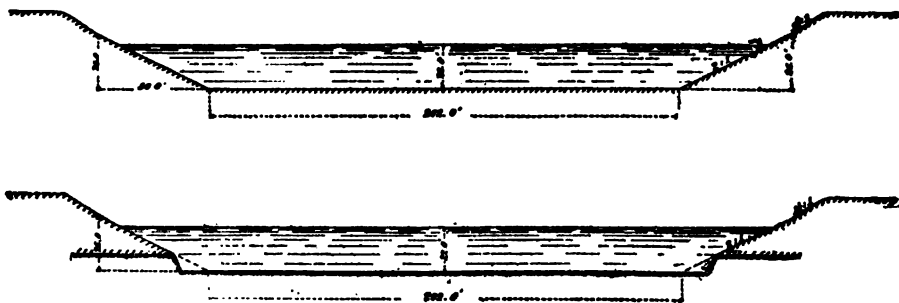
CROSS SECTIONS OF DRAINAGE CHANNEL AND WATERWAY.
